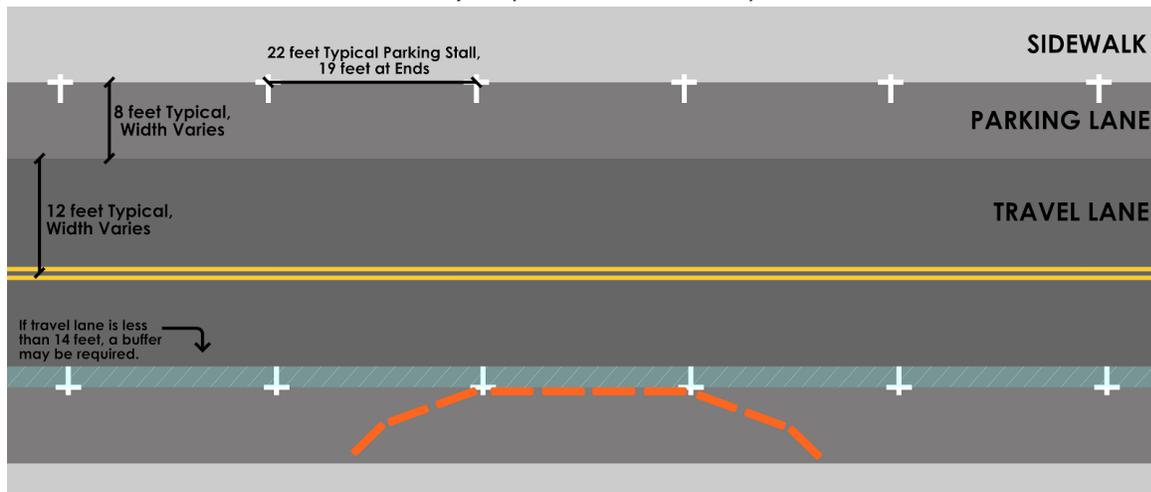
Exhibit B: General Parklet Example (no lane closures) - Cross-section
